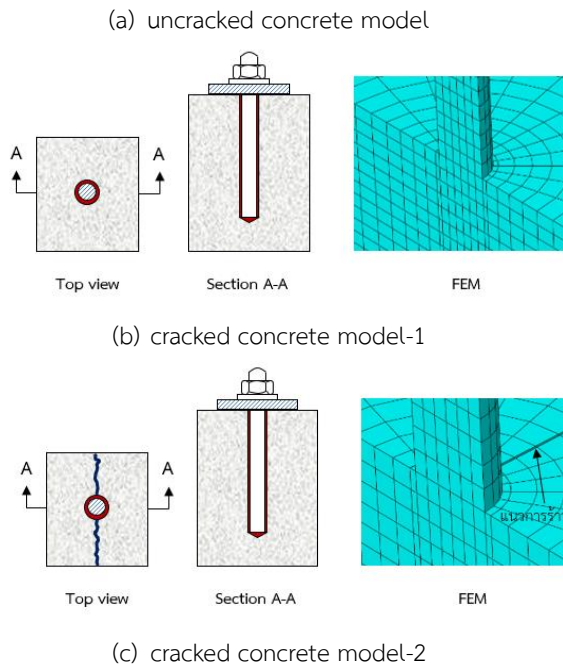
Finite element model of adhesive anchor in uncracked and cracked concrete
